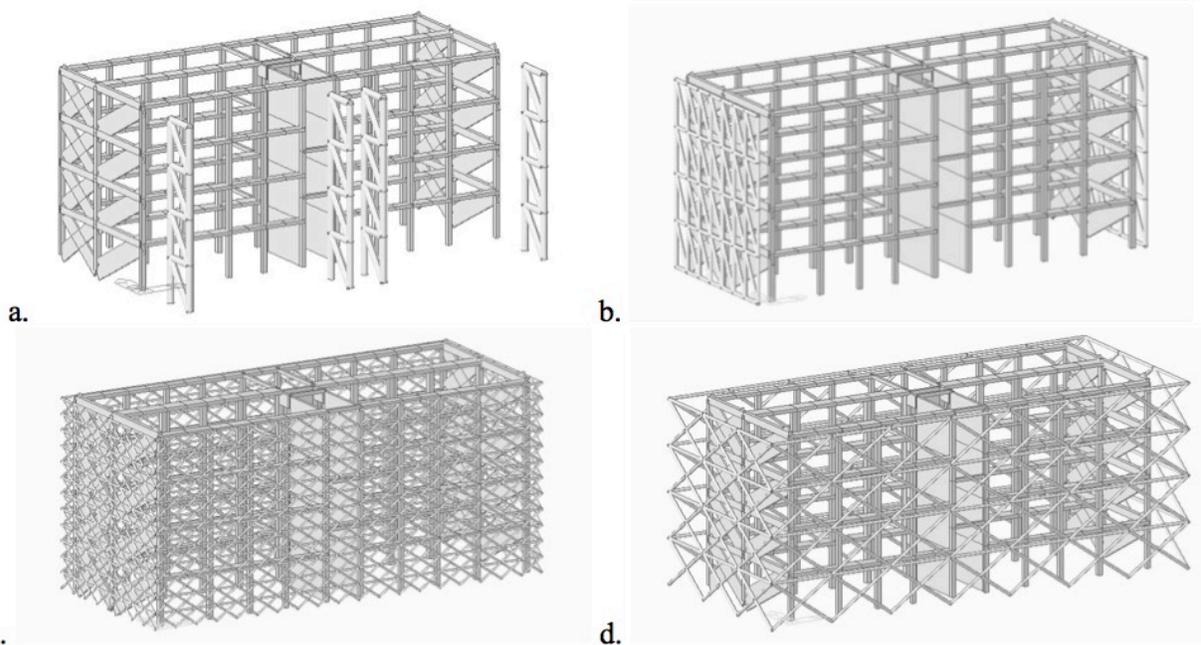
Non-dissipative solutions for the retrofit of the reference existing building: ‘shear wall’ solution – elastic shear walls (a); and ‘shell’ solutions – braced frame façade (b); diagrid A (c); diagrid B (d).
